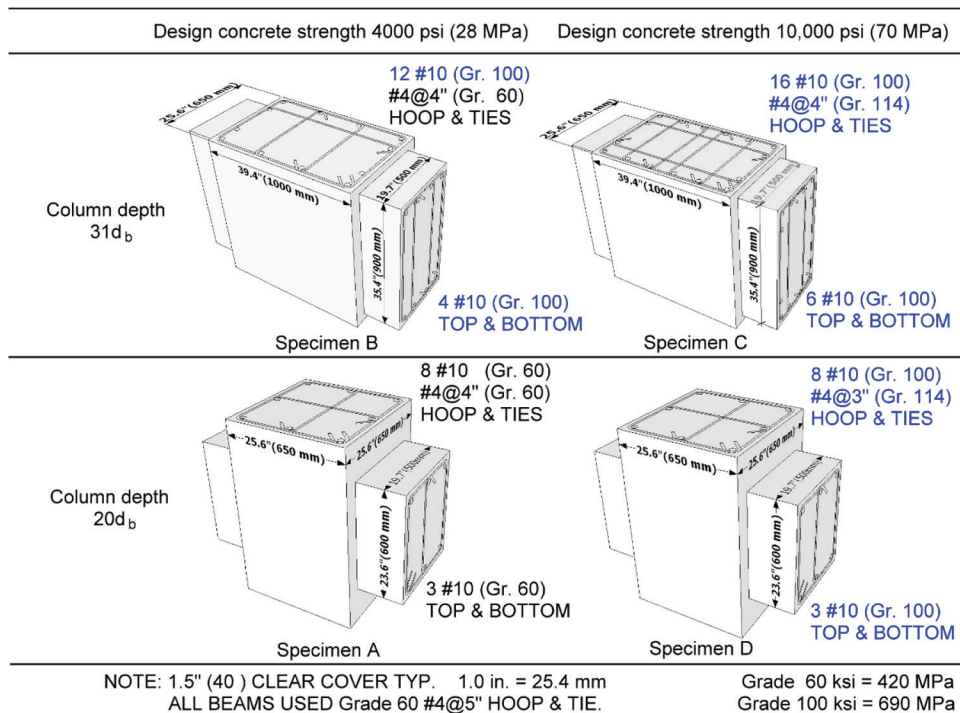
Test matrix and reinforcement layout for beam-column joints.
